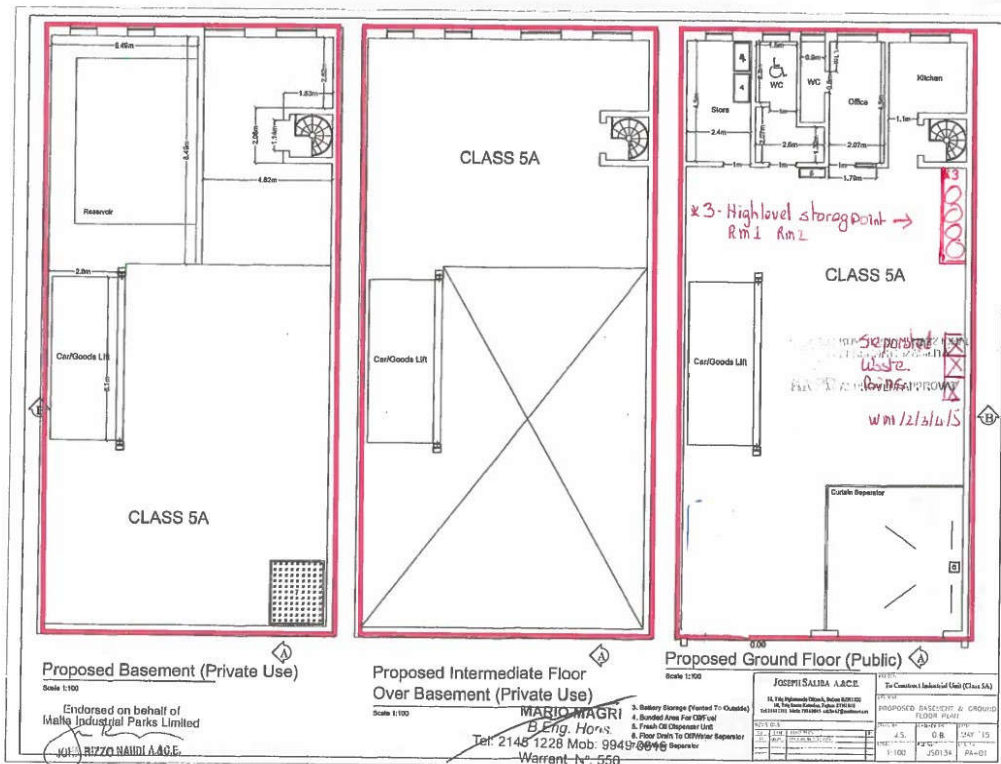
Layout plan showing general workshop areas, wastes & raw materials
